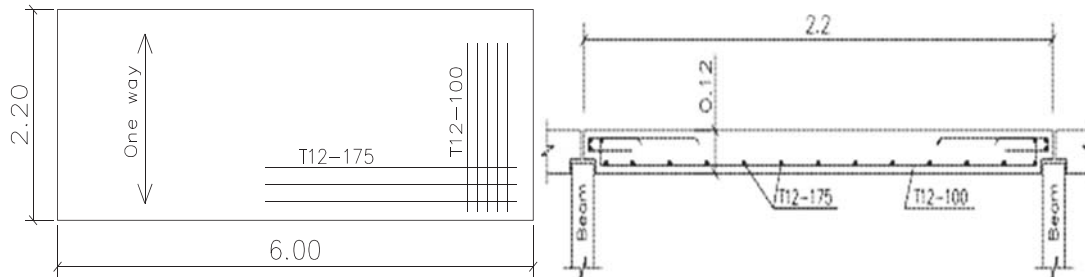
Plan and cross section details of the slab model, dimensions in meter
